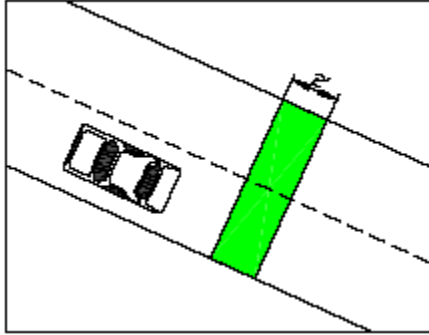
Example 8: Surface tolerances for street repairs should meet the standard for new construction.
